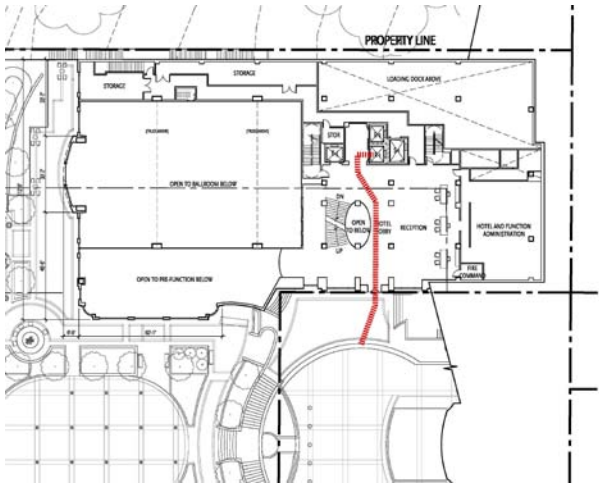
ADA Access from Guest Drop-Off to Elevator
